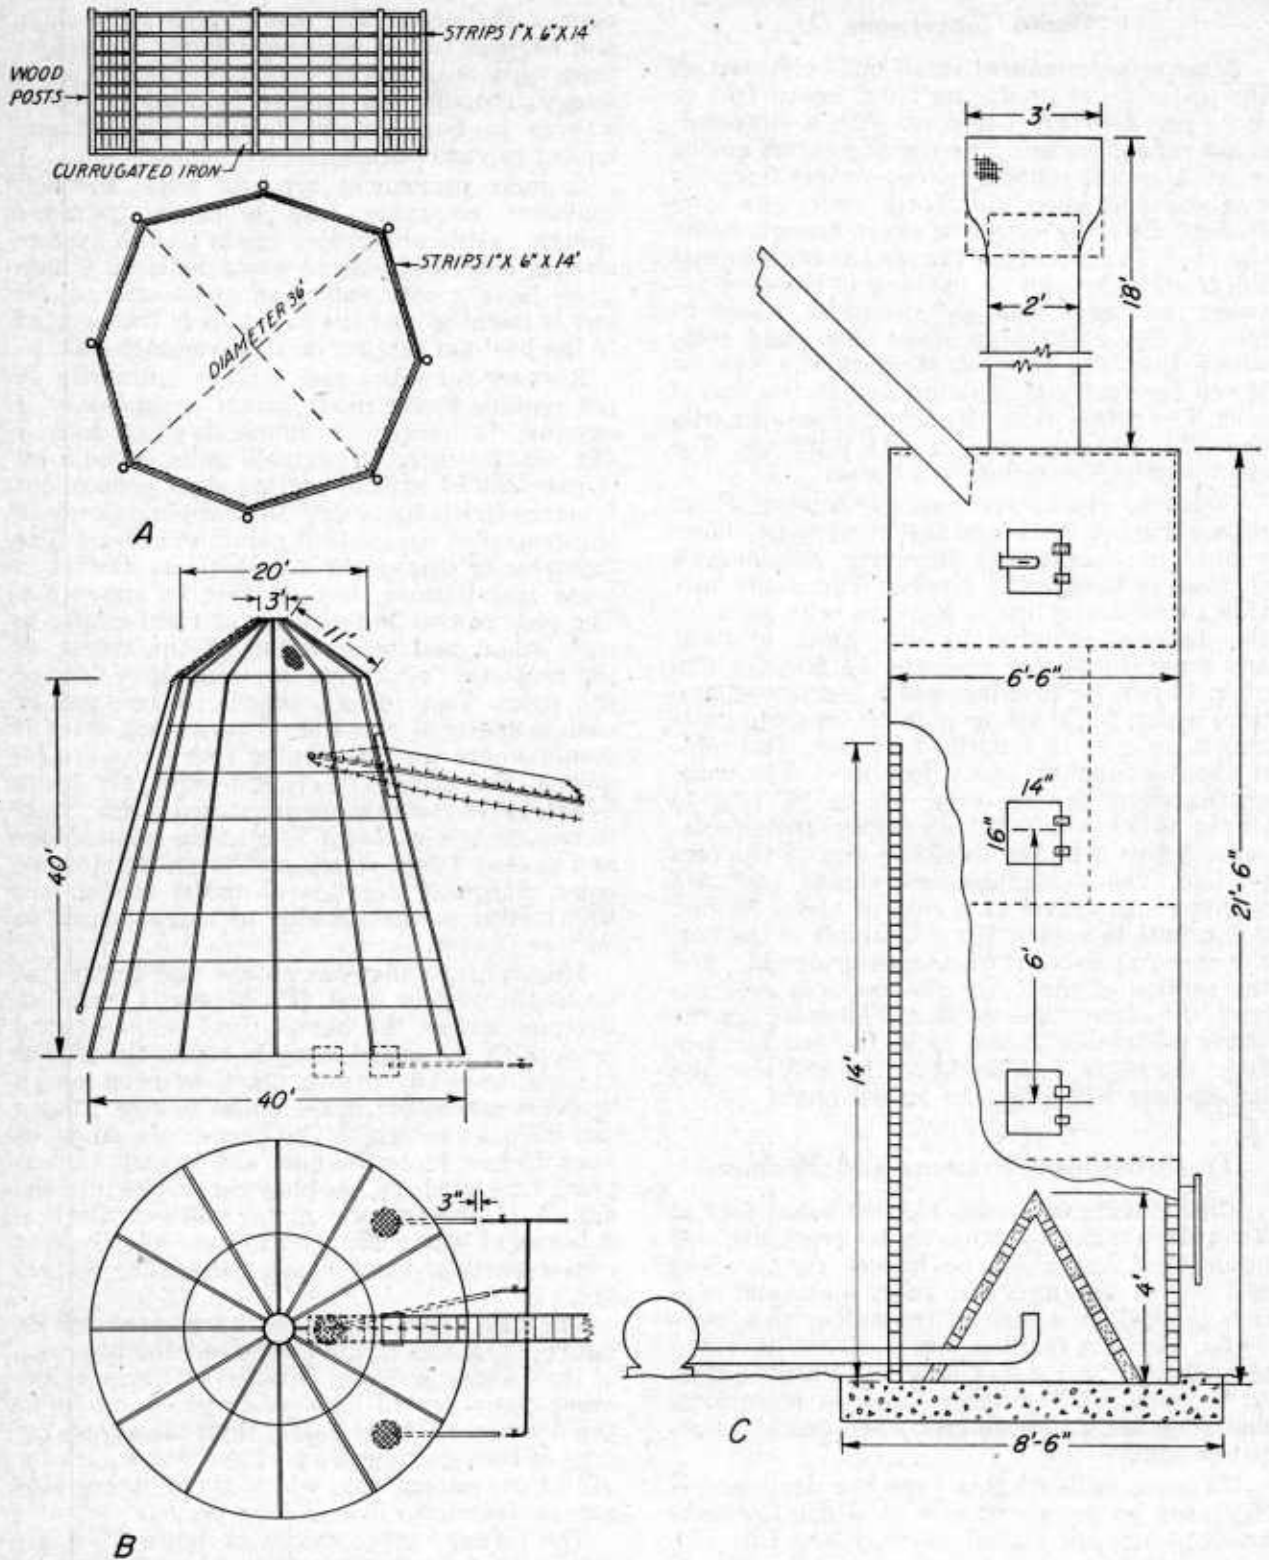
Three types of refuse burners. A, Pit type for portable mills; B, enclosed refuse burner; C, enclosed sawdust burner. Types B and C approved by California State Division of Forestry on basis of safety.
